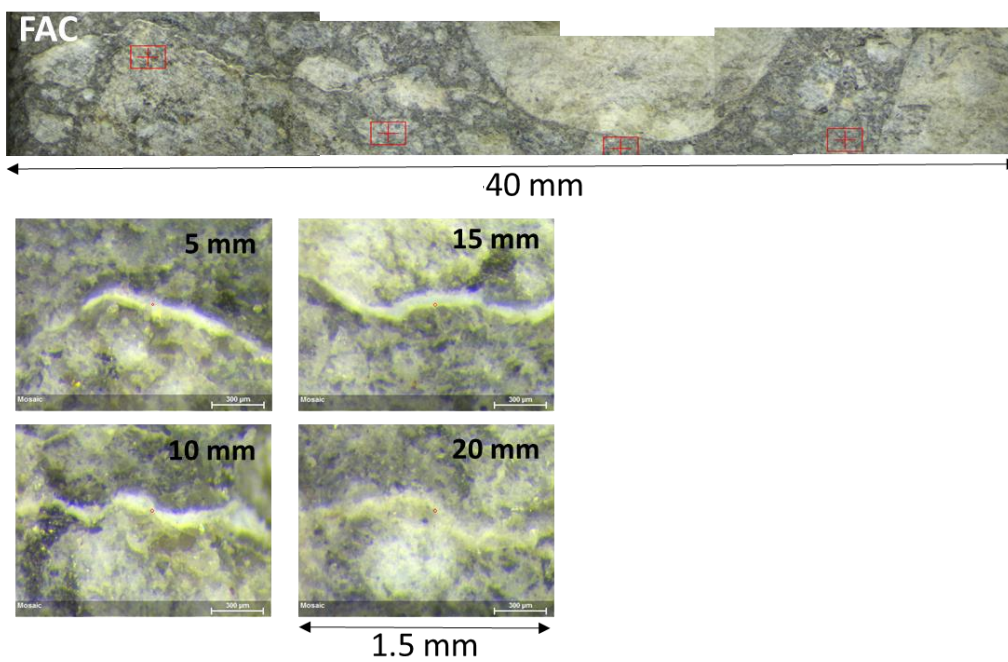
Overview picture and detailed pictures at different crack depth of the crack in core FAC
